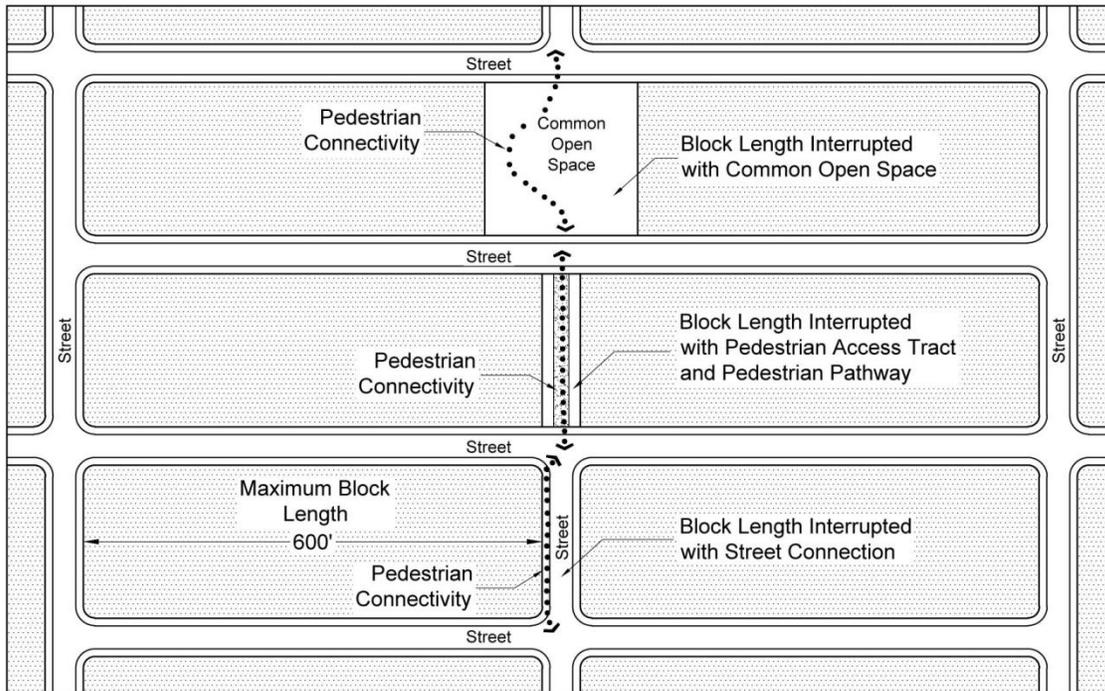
(a).2. – Site Layout – Block Length Standards
